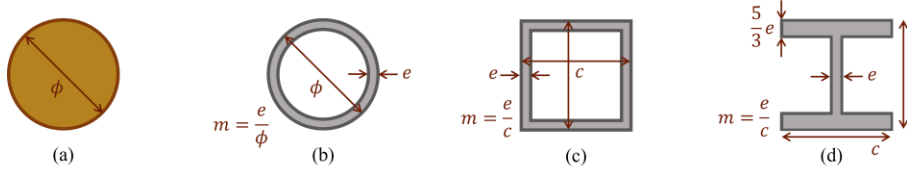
(a) Full circular section, (b) Empty circular section, (c) Empty square section and (d) I-section with proportions similar to a HEB cross-section.
